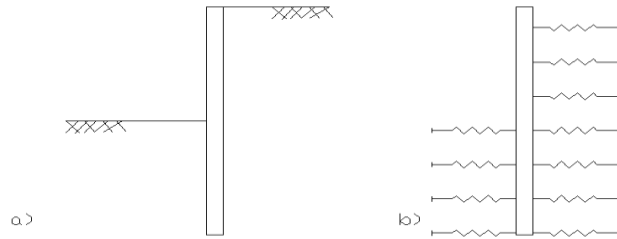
Representation of a retaining wall and excavation: a) real situation, b) Winkler model
